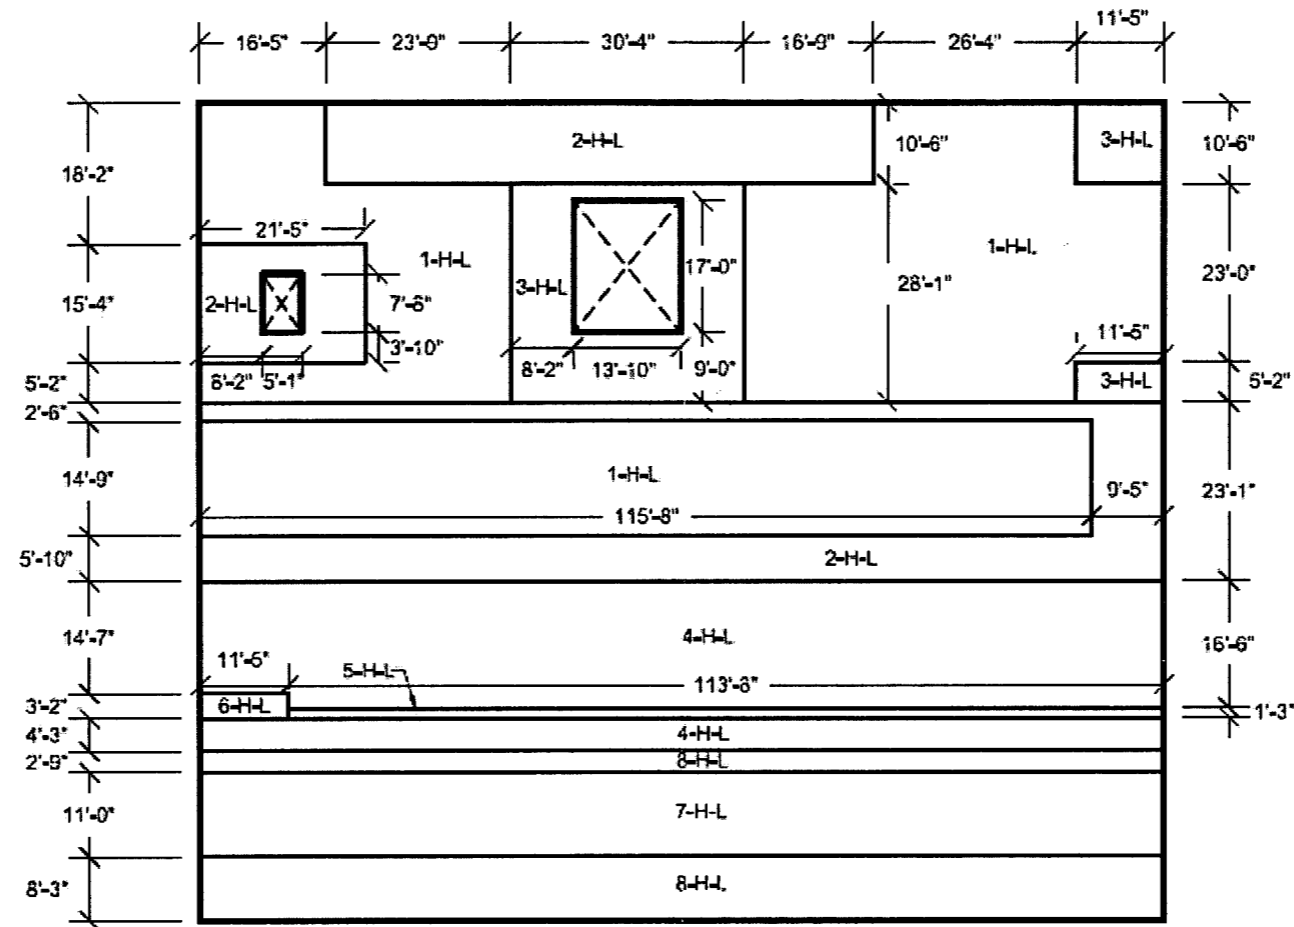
H.3-17: SOUTH WALL LOOKING NORTH
